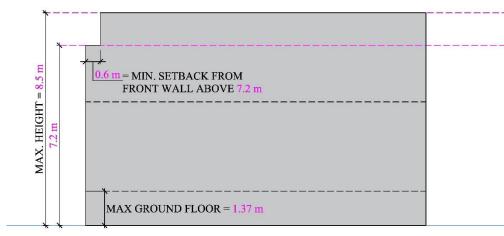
K.F5: Flat Roof Building with Side Yard Setback Less Than 1.2 Metres
